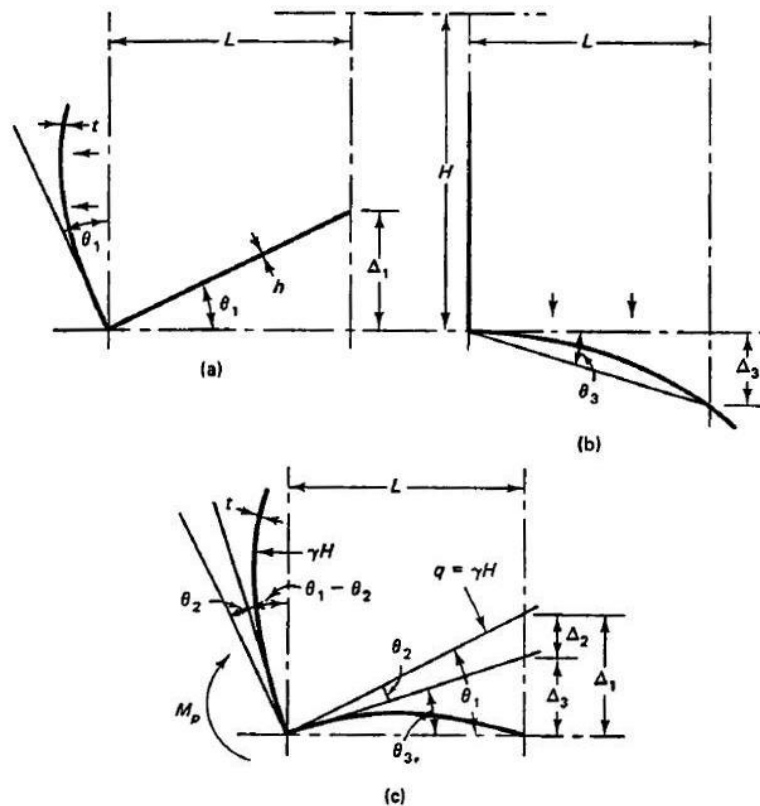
Deformation and rotation of wall base. (a) Fully free wall. (b) Fully fixed wall. (c) Superposition of (a) and (b).
